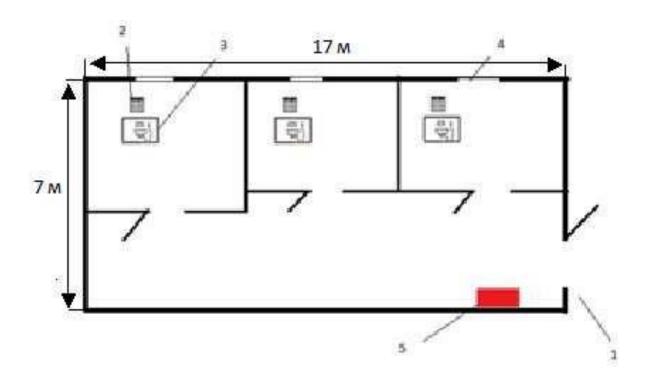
Room plan 1-front door; 2- chair; 3- table; 4- windows; 5- extinguisher
